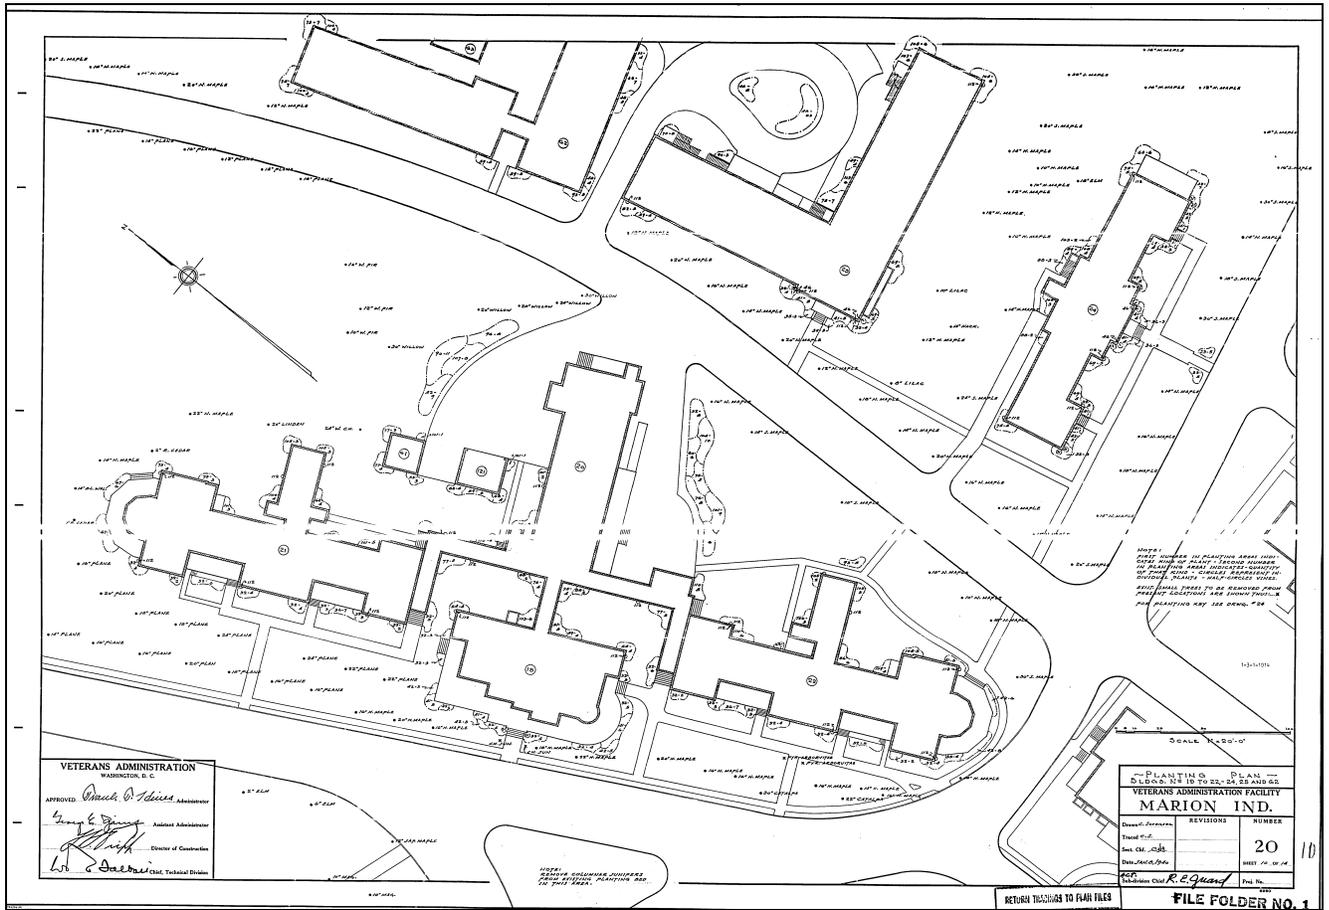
Site Plan of Marion Branch Hospital, 1940.
